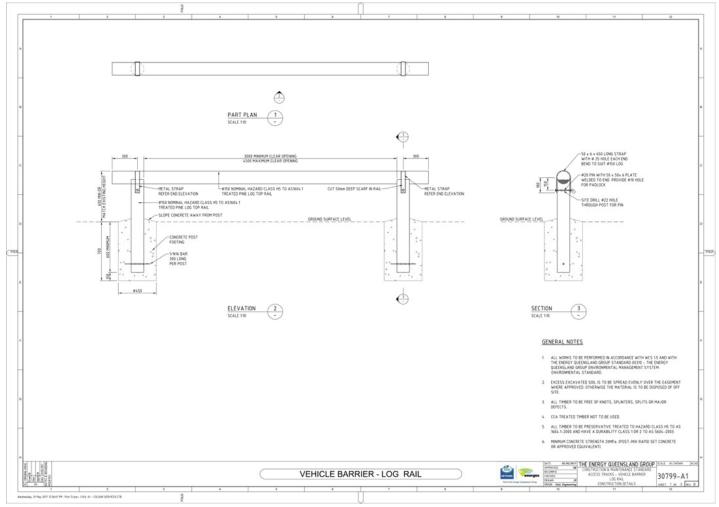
Access Track Infrastructure – Fencing Locking Rail – Log Rail Barrier Details.
